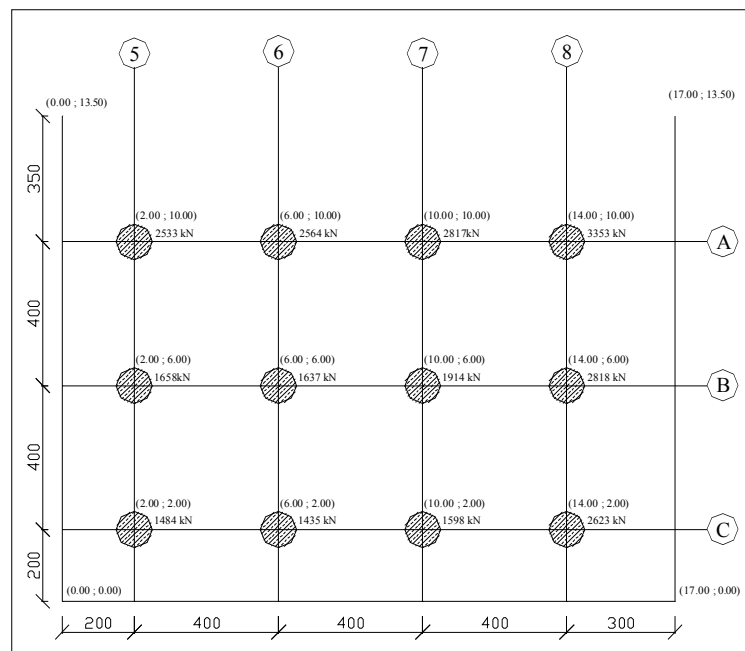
Pile disposition plan and pile loads (12 piles with 25m length) for the improved soil profile
